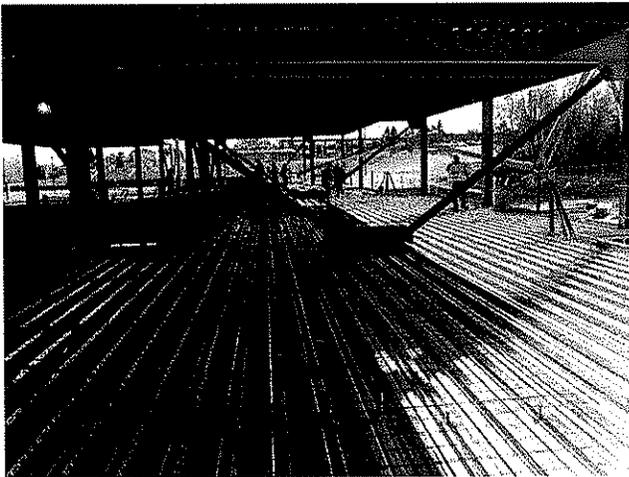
View east on the 2<sup>nd</sup> floor of segment F. October 20, 2010.
